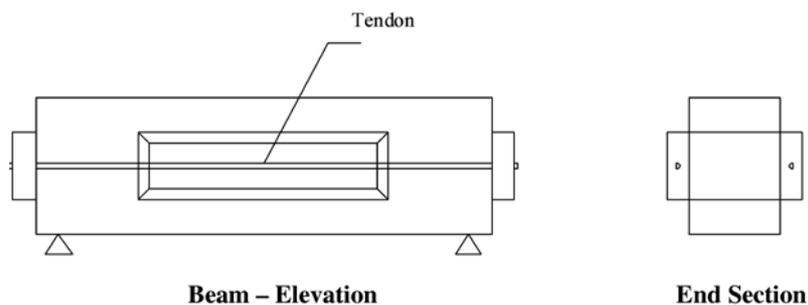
Anchoring of External Prestressing (EP) at the ends
